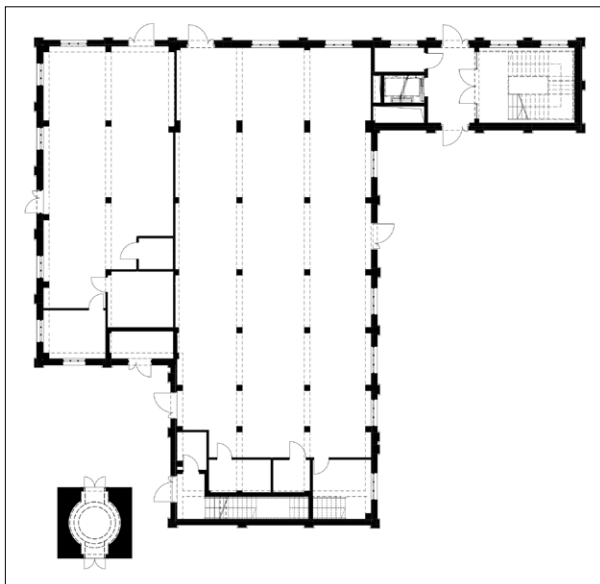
Incineration Plant, ground floor plan of the building and smokestack; image courtesy of Litoborski+Marciniak.
